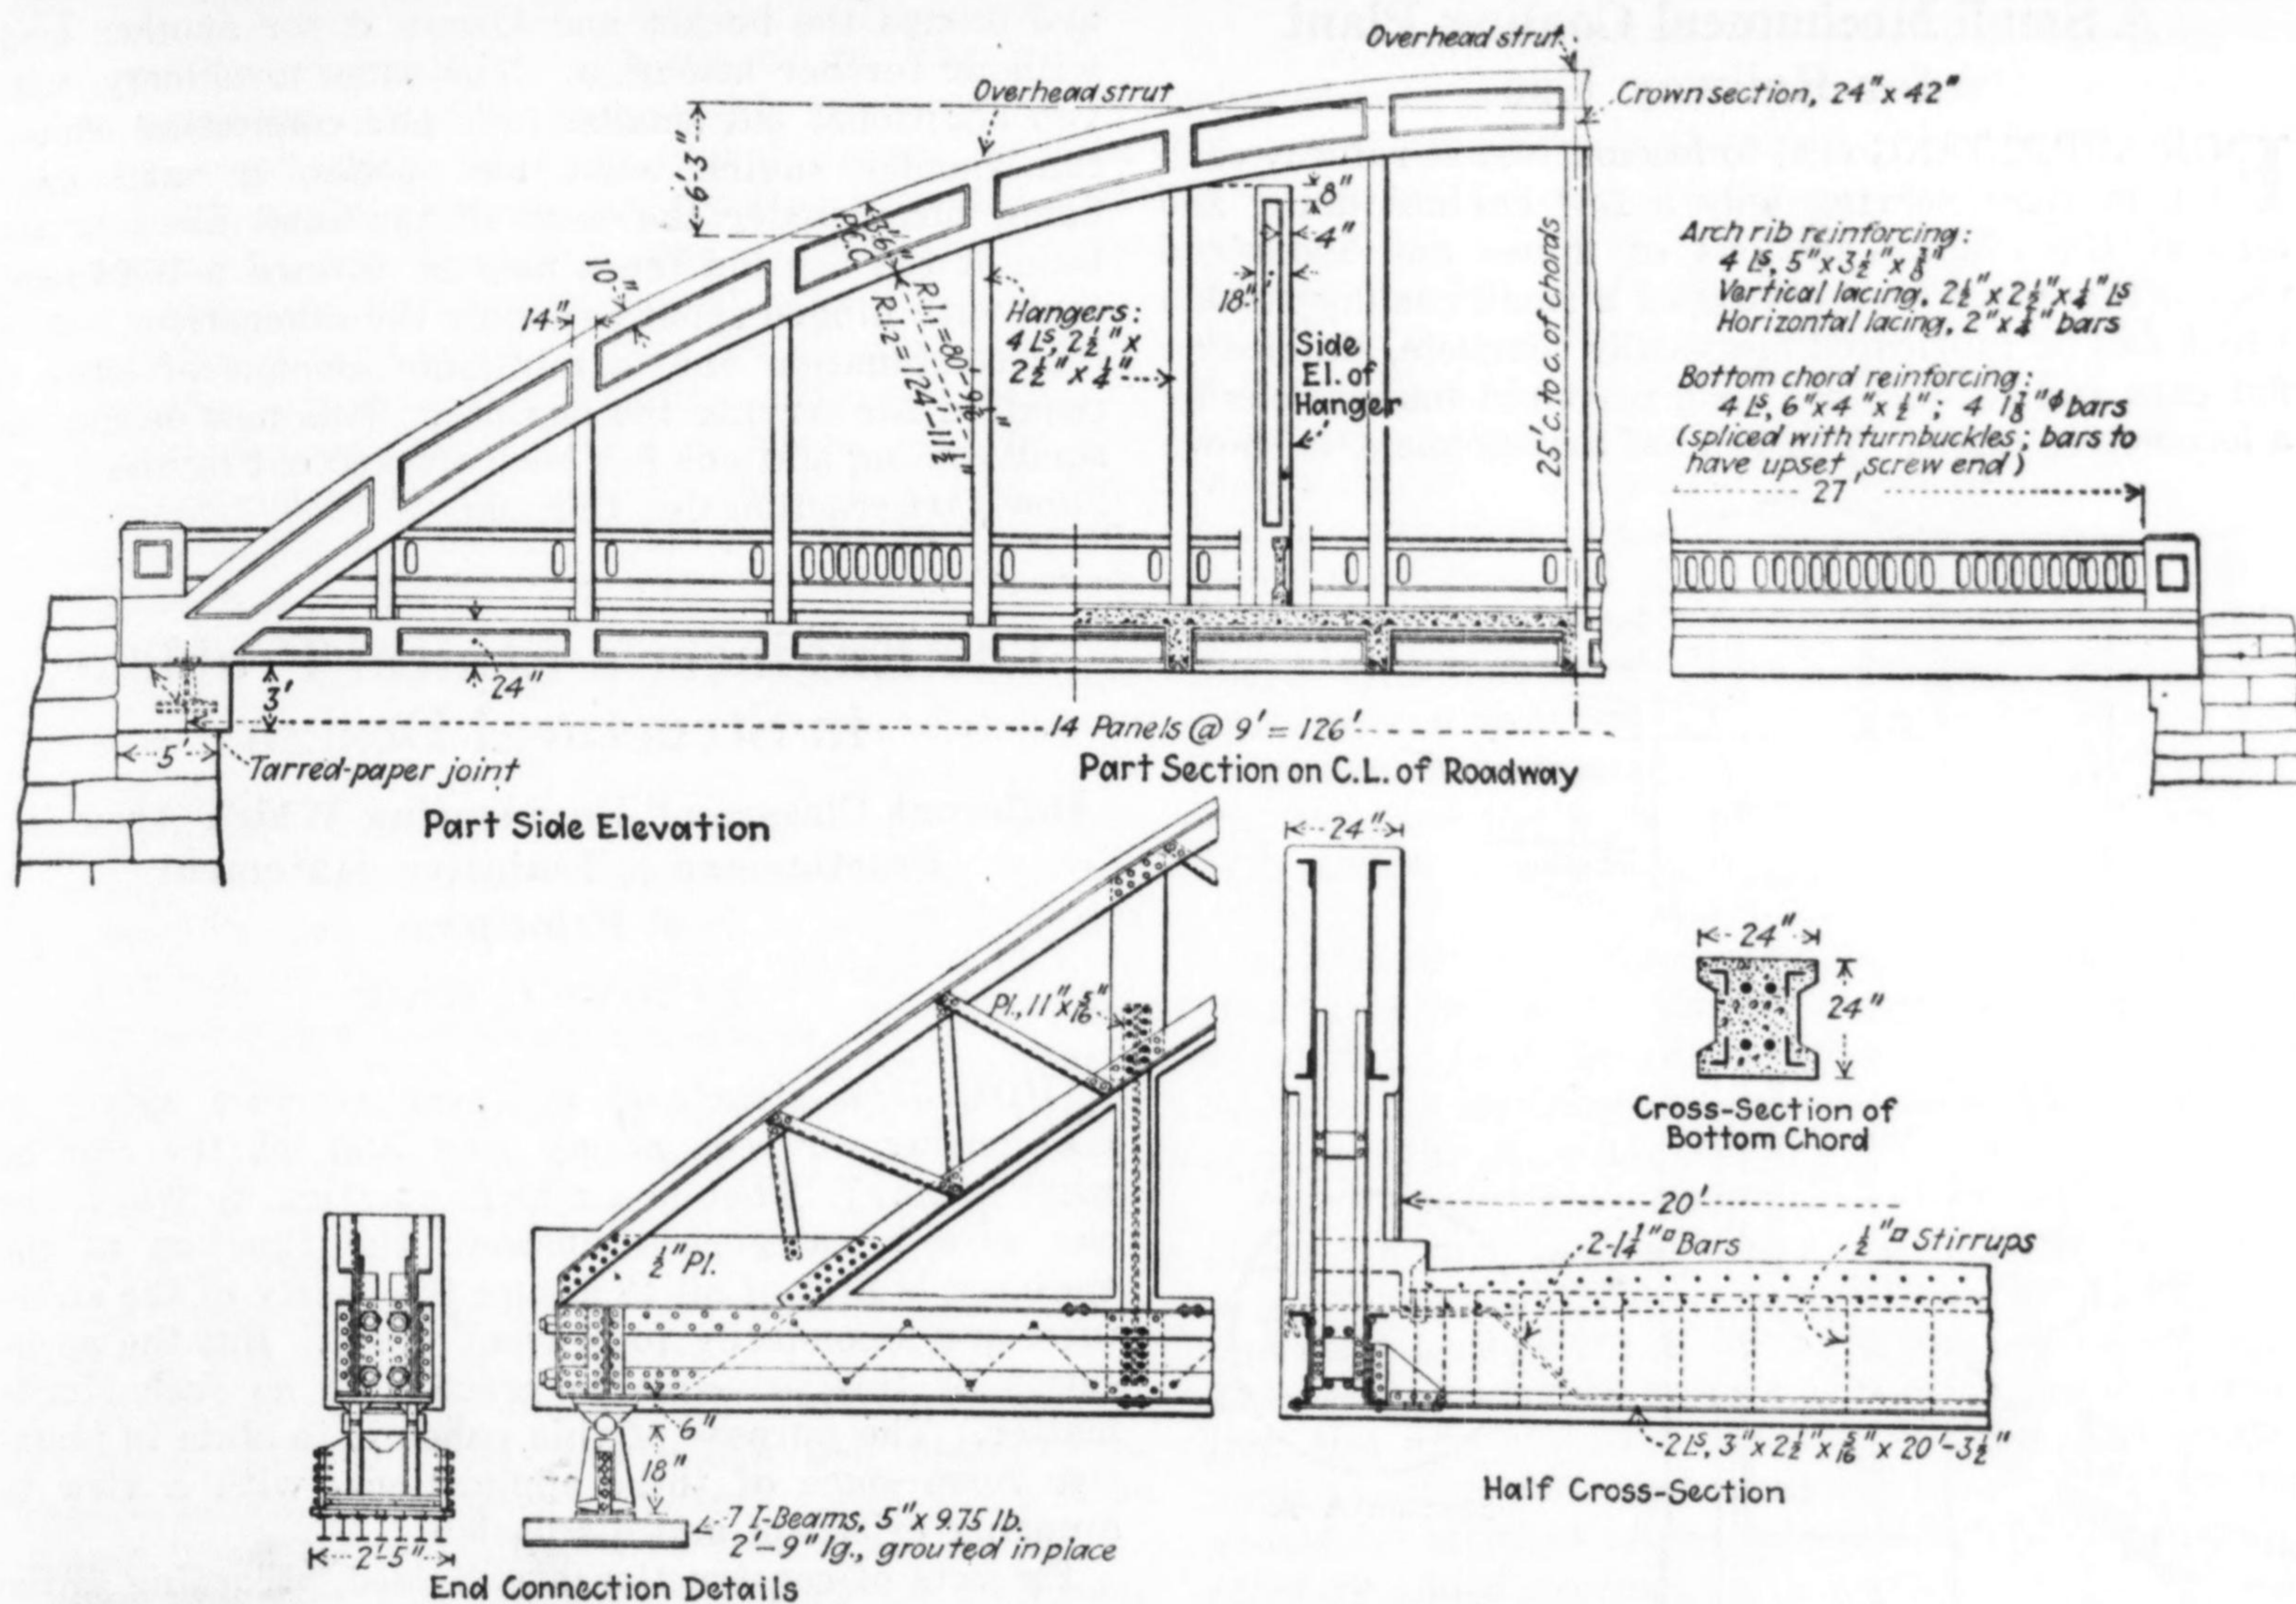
CONSTRUCTION FEATURES OF COTTONWOOD RIVER BRIDGE
